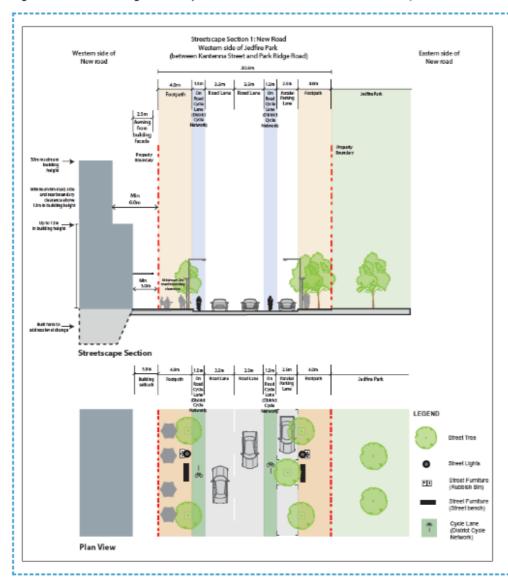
Park Ridge streetscape: New Road - Western side of Jedfire Street (between Kantenna Street and Park Ridge Road)
